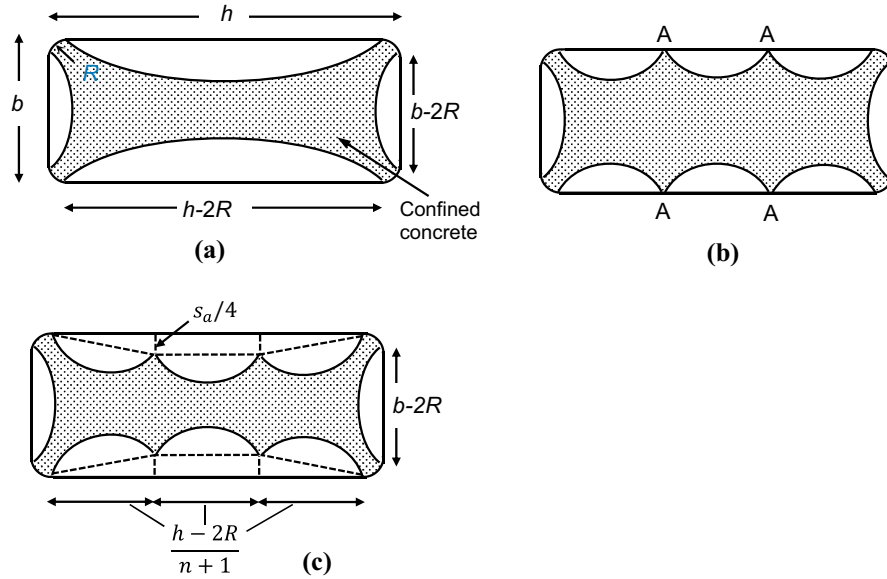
Effectively confined cross section areas: a cross section in columns without anchors or with light anchors, which failed prematurely, b columns with heavy anchors, cross section at the
